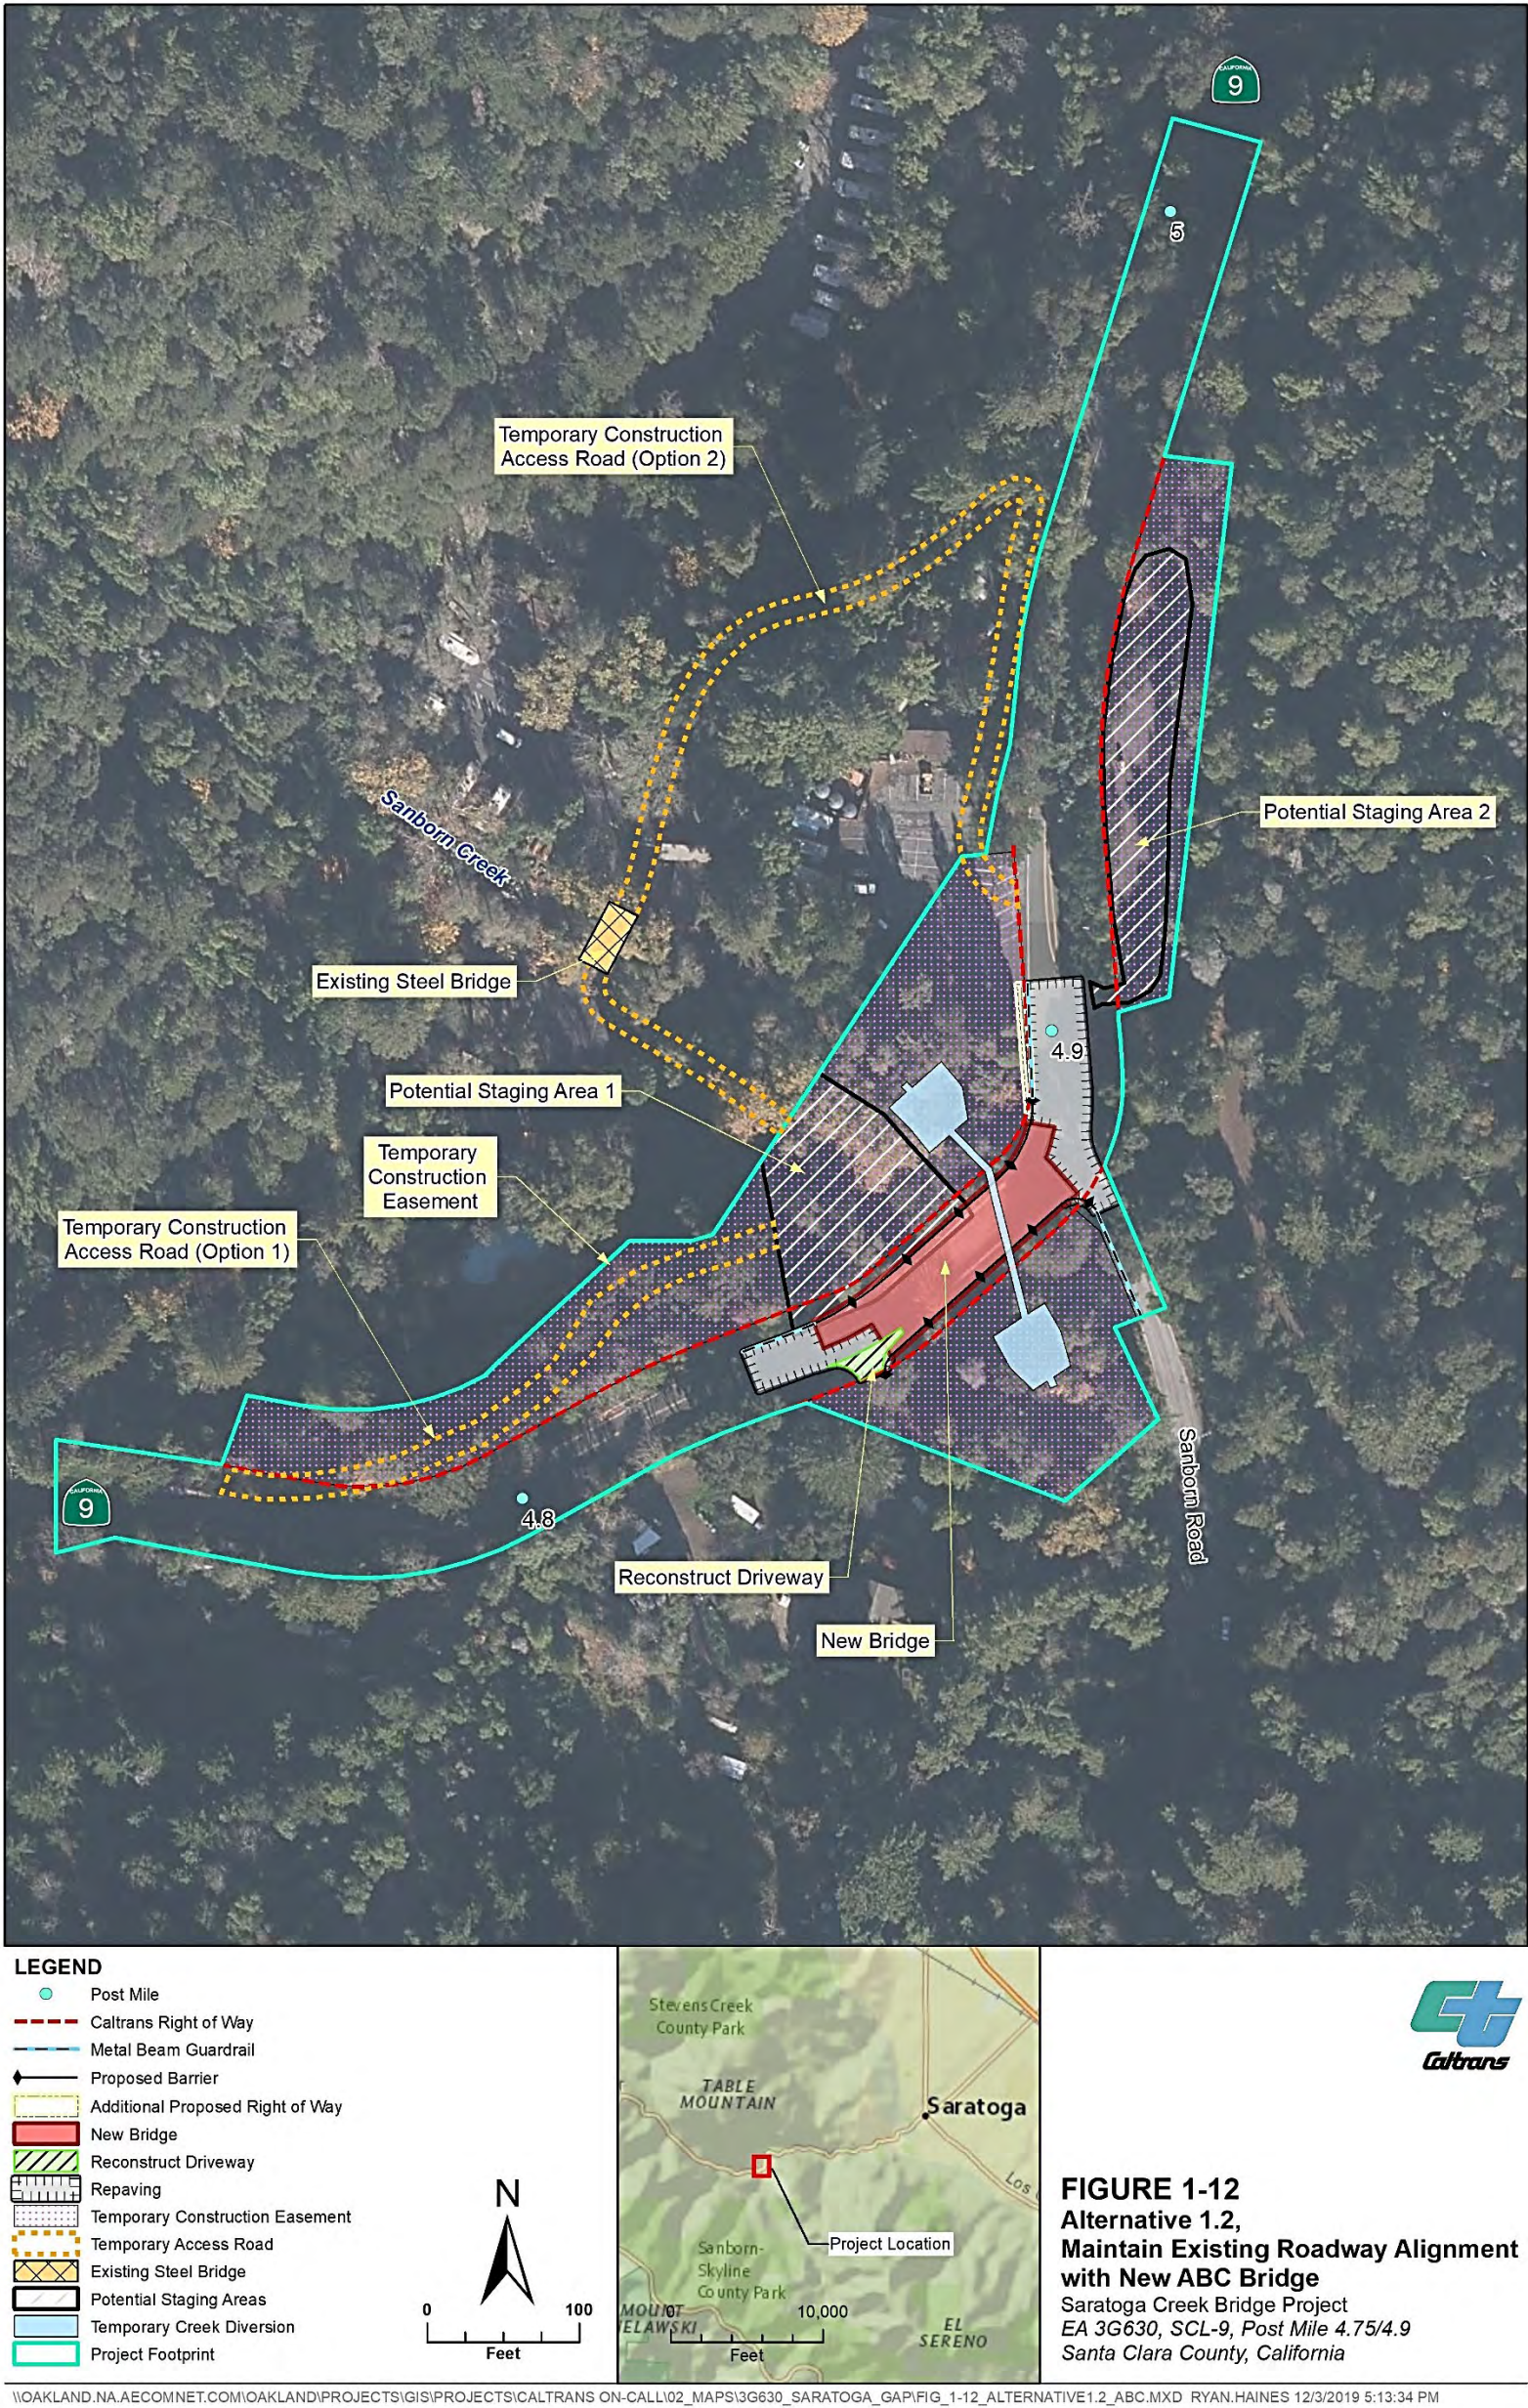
Alternative 1.2 Proposed Layout: Maintain Existing Roadway Alignment with New Accelerated Bridge (ABC Alternative)
